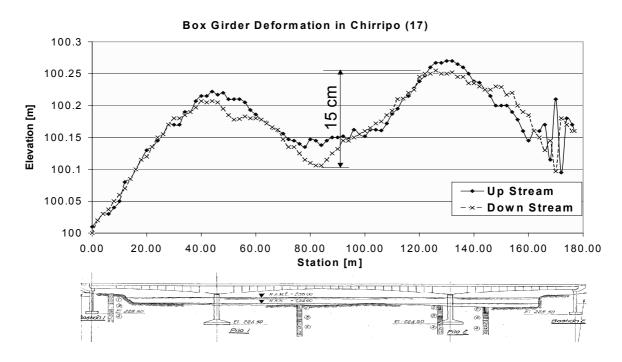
Deformation of Box Girder in Rio Chirripo Bridge (No.17)
